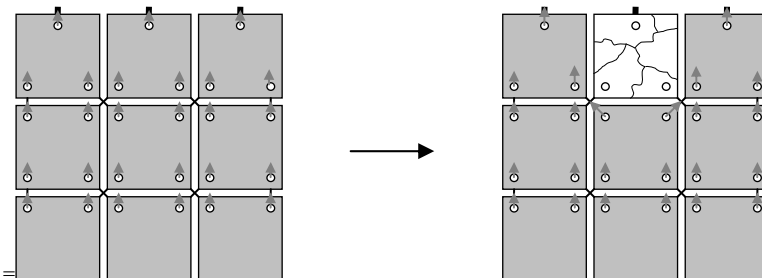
, b, c Principle of the alternative load path design in the hanging glass façades of the Serres at La Villette: the panels are joined with cross shaped connectors, allowing a redistribution of loads through adjacent panels in case one should break.
